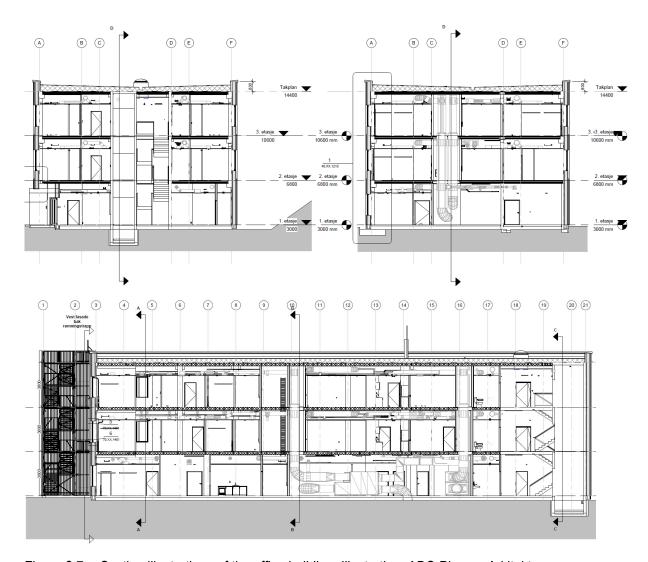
Section illustrations of the office building. Illustration: ABO Plan og Arkitektur.
